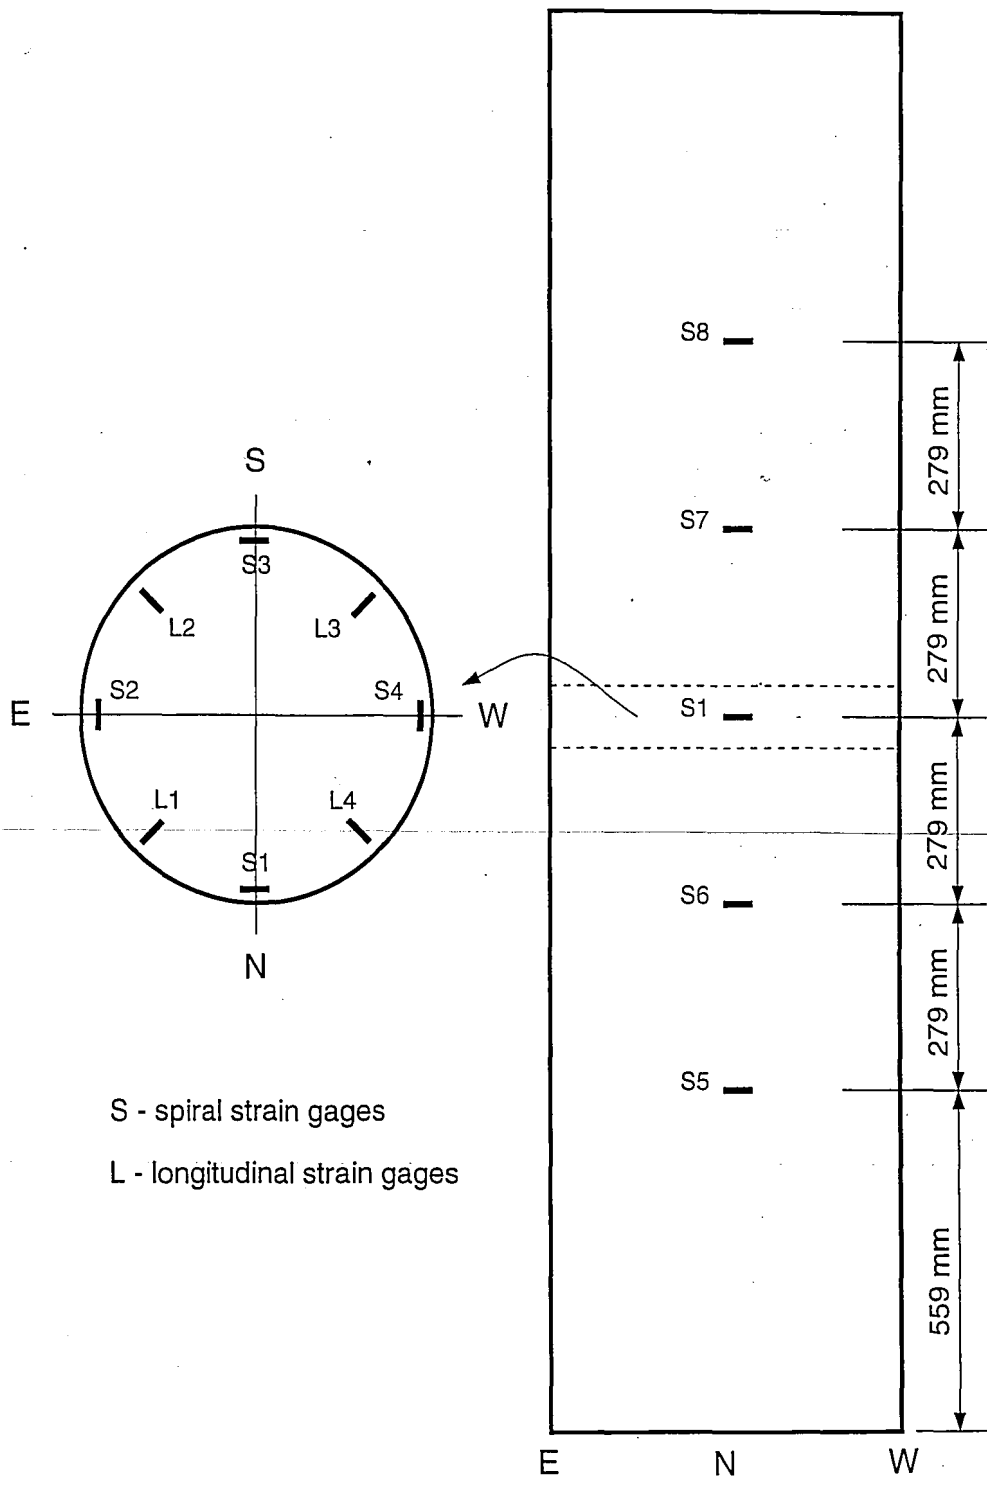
Instrumentation Plan A - Layout of strain gages.
